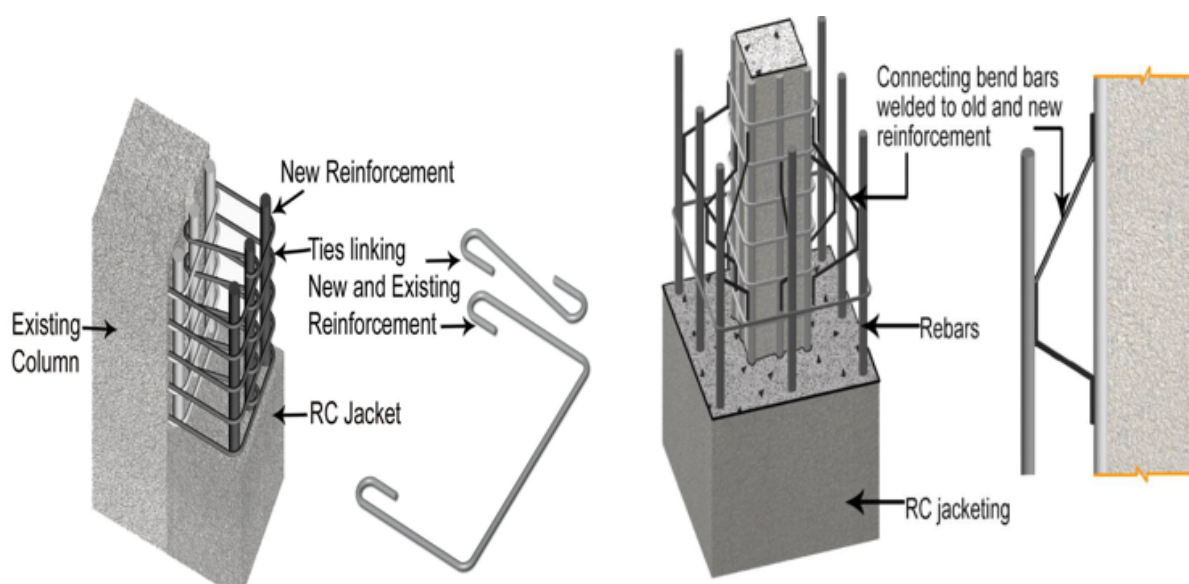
RCC jacketing of existing column (credit: TESRA ppt)
